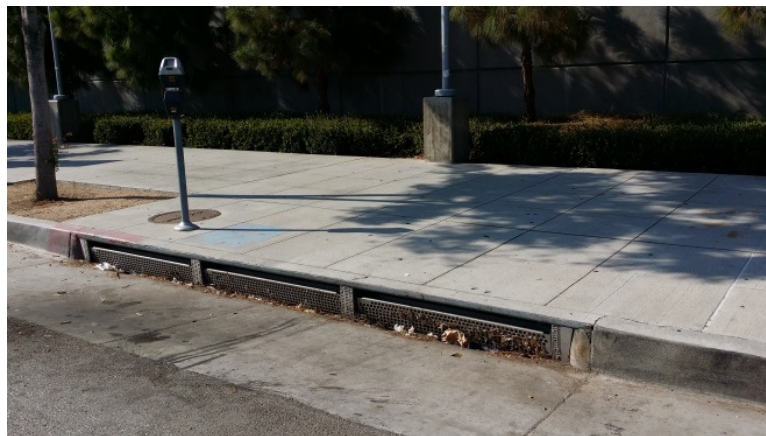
Storm Drain Inlet with Screens Along Marengo Street
